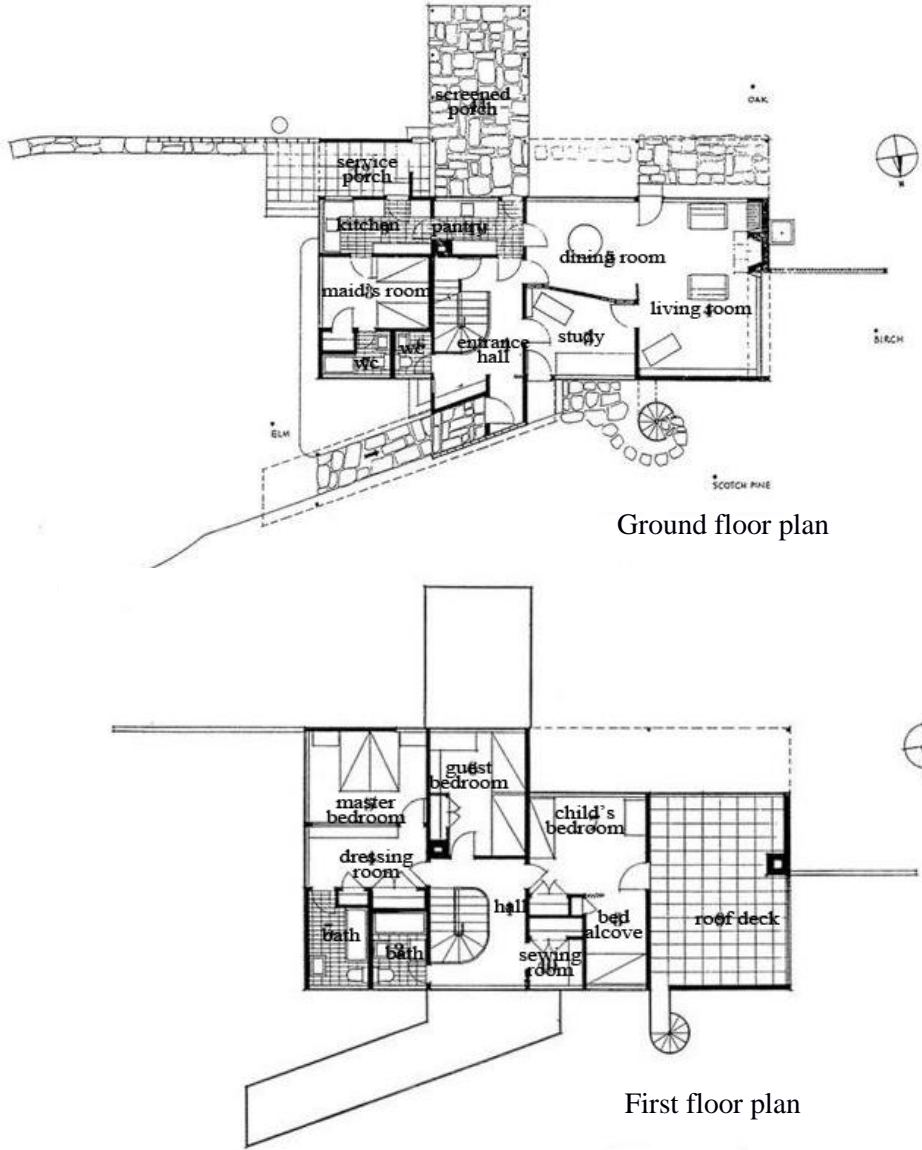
Plan Layout of Walter Gropius House 1938, Lincoln, MA. USA
